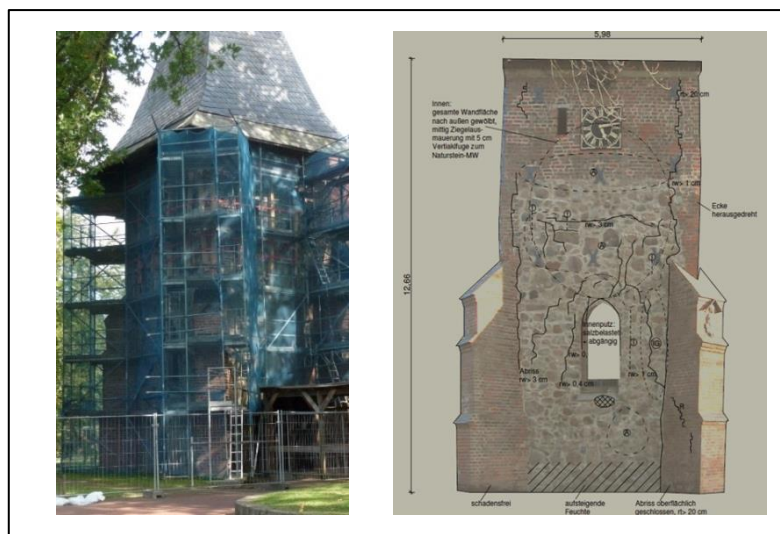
St. Urbani Church in Munster, Germany, a) mixed masonry of bell tower of the church; natural stones and bricks, during restoration, b) damaged masonry of tower after the first restoration in 2003.
